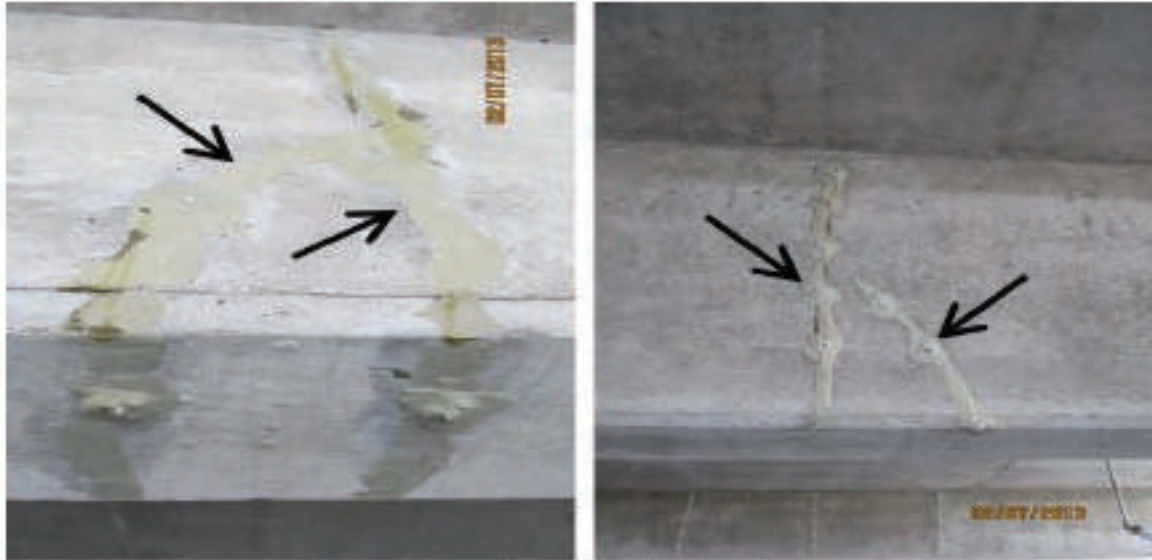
Epoxy Injected Cracks (Horizontal and Vertical Surfaces)
